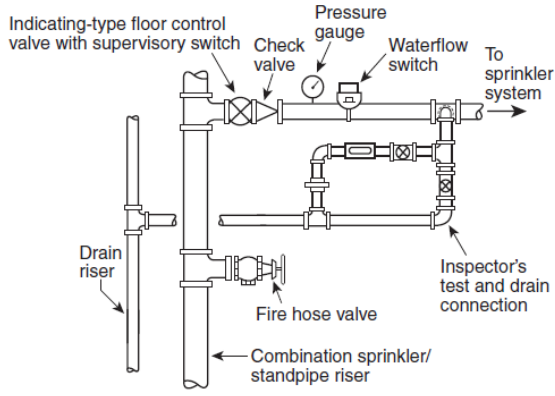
(a) Acceptable Piping Arrangement for Combined Sprinkler/Standpipe System. [14: Figure A.7.10.1.3.1(a)]
